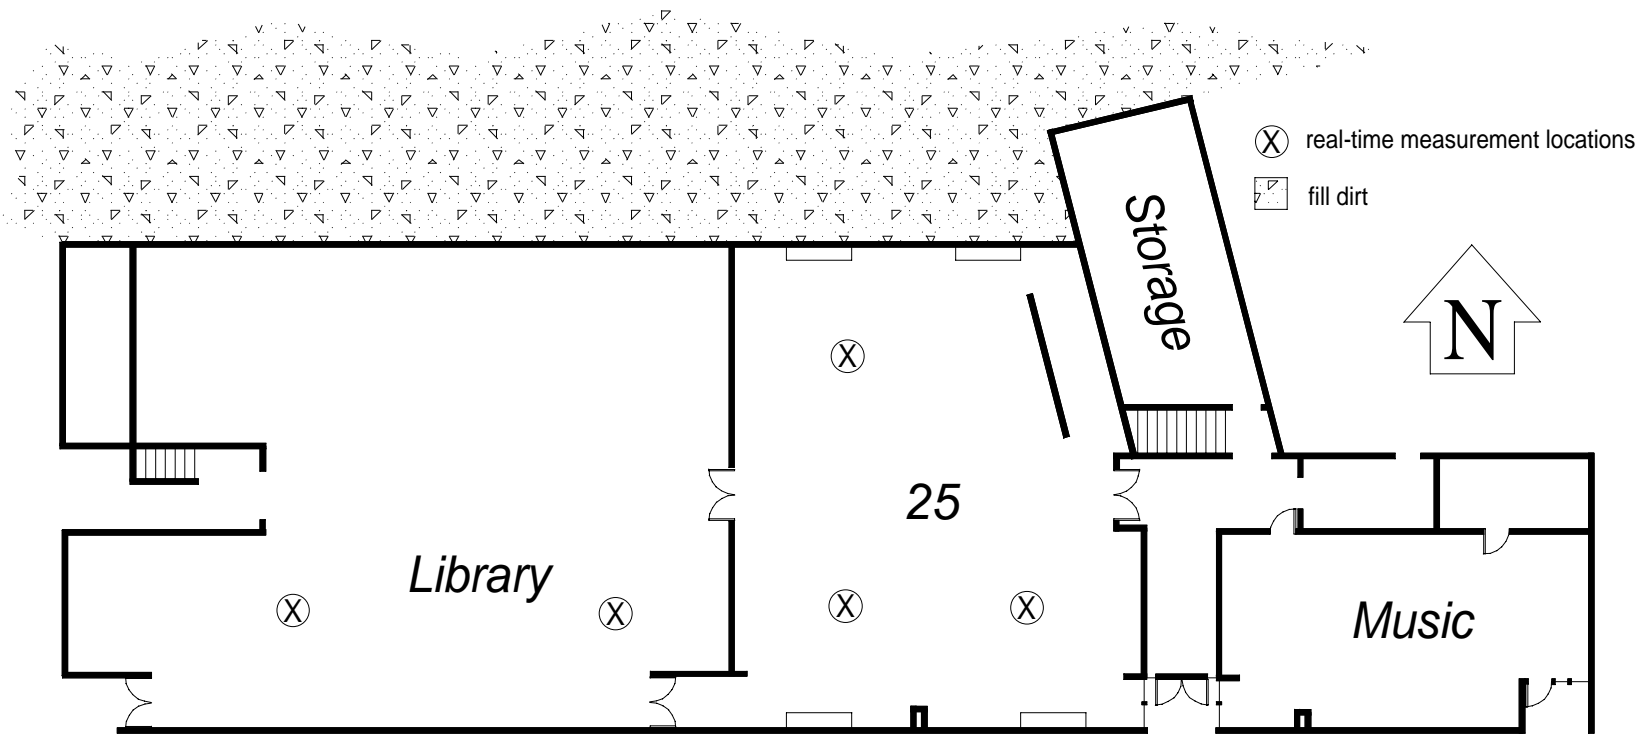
Ground Floor Plan Drawing, Houghtaling Elementary School, Ketchikan, Alaska
